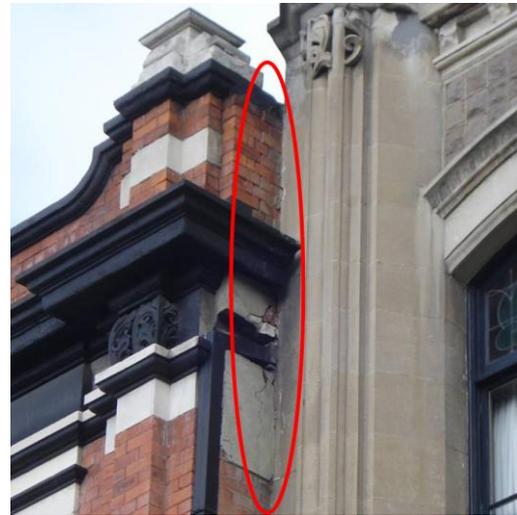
Damage to wall resulting from adjacent facade setback
